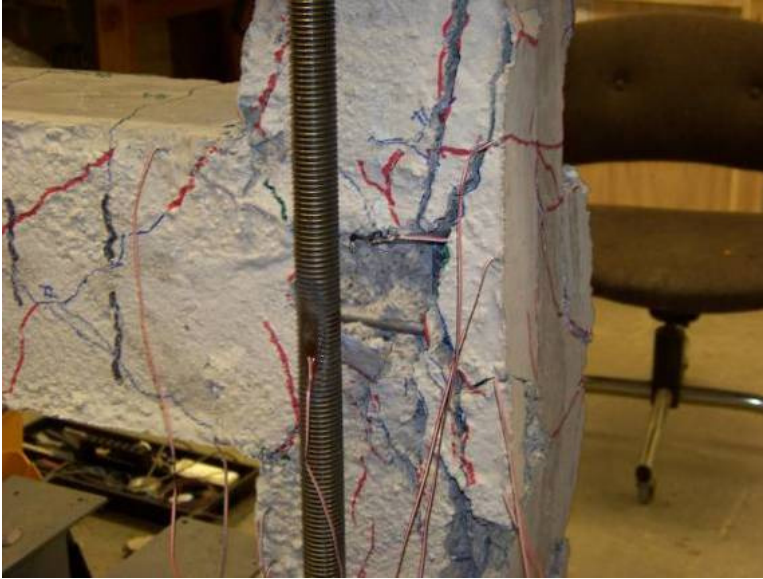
Specimen 3 joint region at failure (Fisher 2009)
